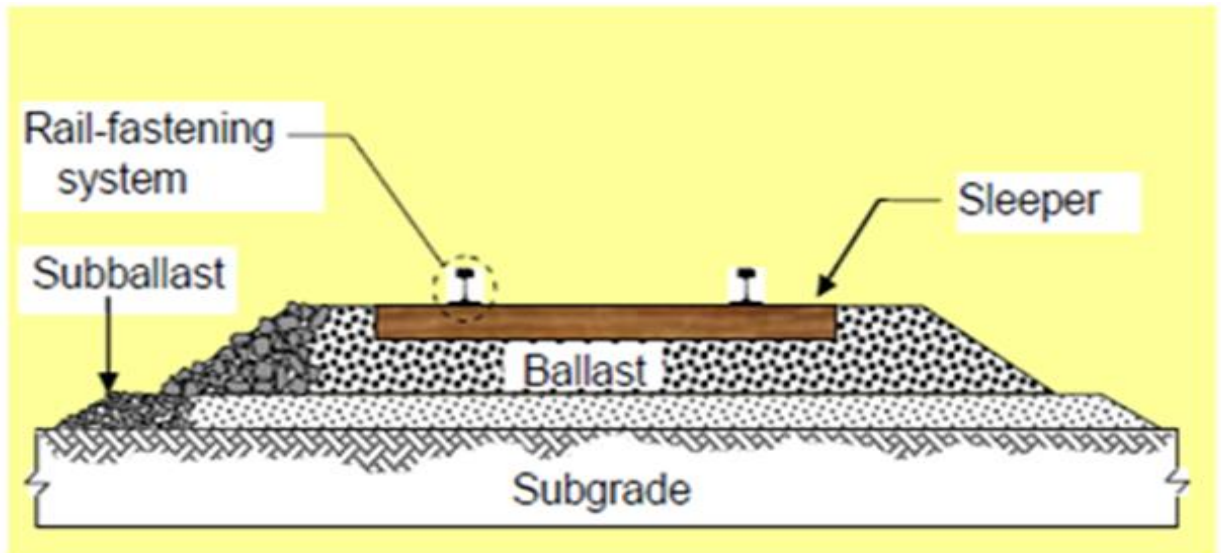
The cross section of Atypical ballasted railway track indicating main components of railway structure (Khabbaz, ---)
